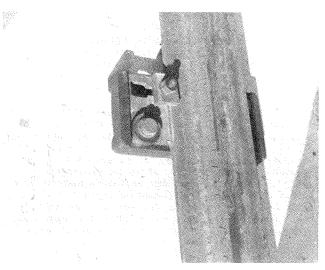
Landis rail fastener installed on BART aerial structure.
